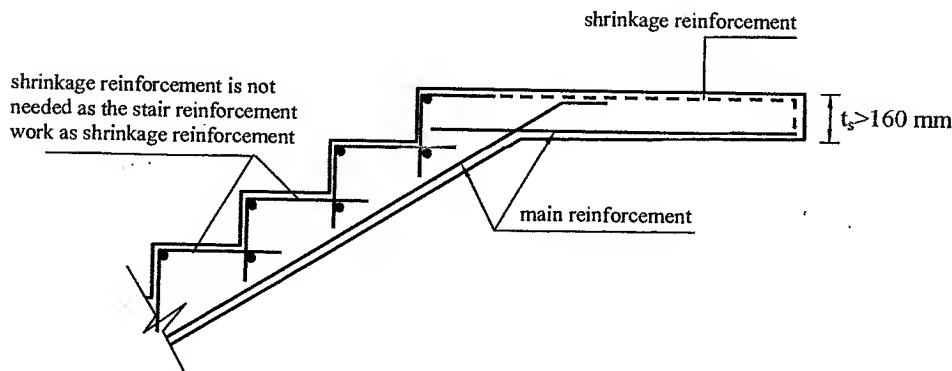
Shrinkage reinforcement for slab greater than 160 mm
